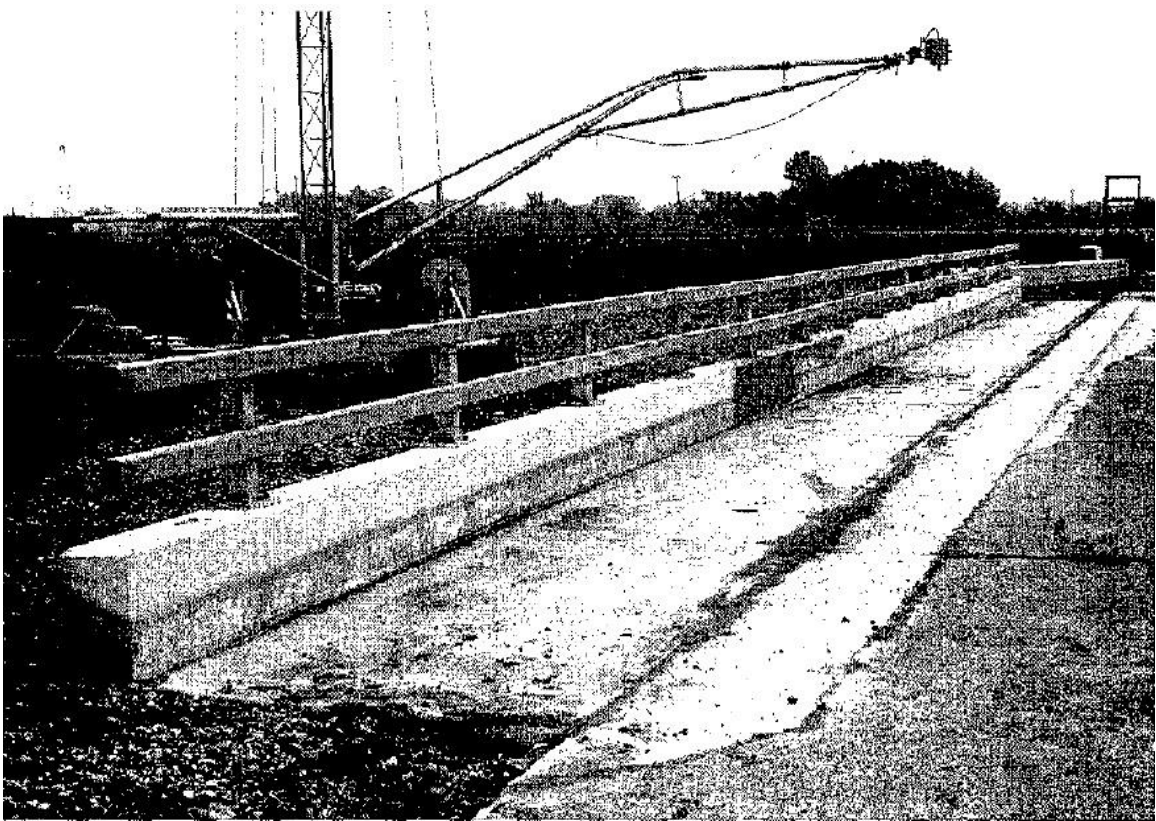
BR27D Bridge Railing on Bridge Deck [7]
